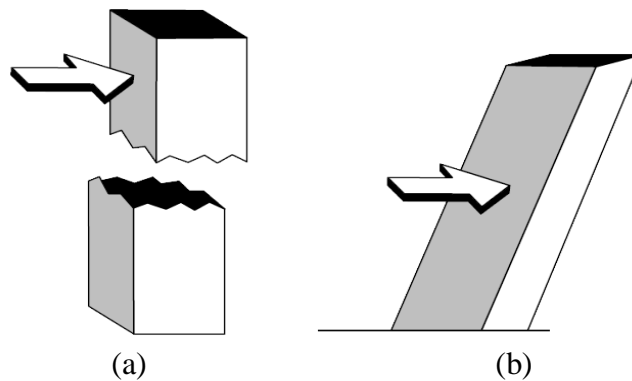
Fig. B. building shear resistance: (a) building must not break and (b) building must not have excessive shear deflection
